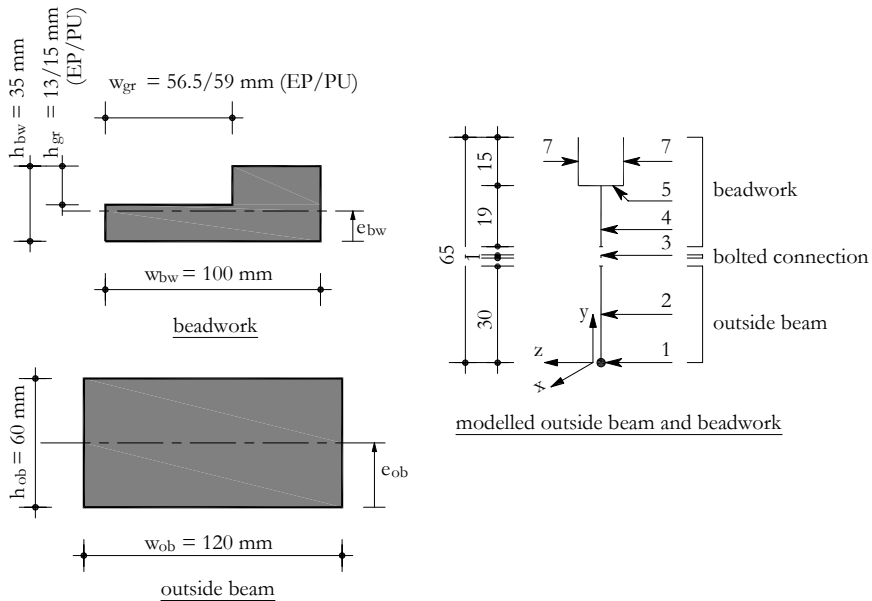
Real (left) and modelled (right) cross section of the outside beam and the beadwork
